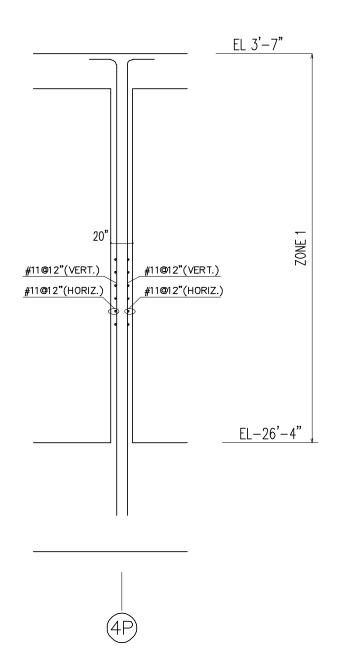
Typical Reinforcement in Interior Wall – SECTION 2 (On Column Line 4P and Between Column Lines BP & CP)
